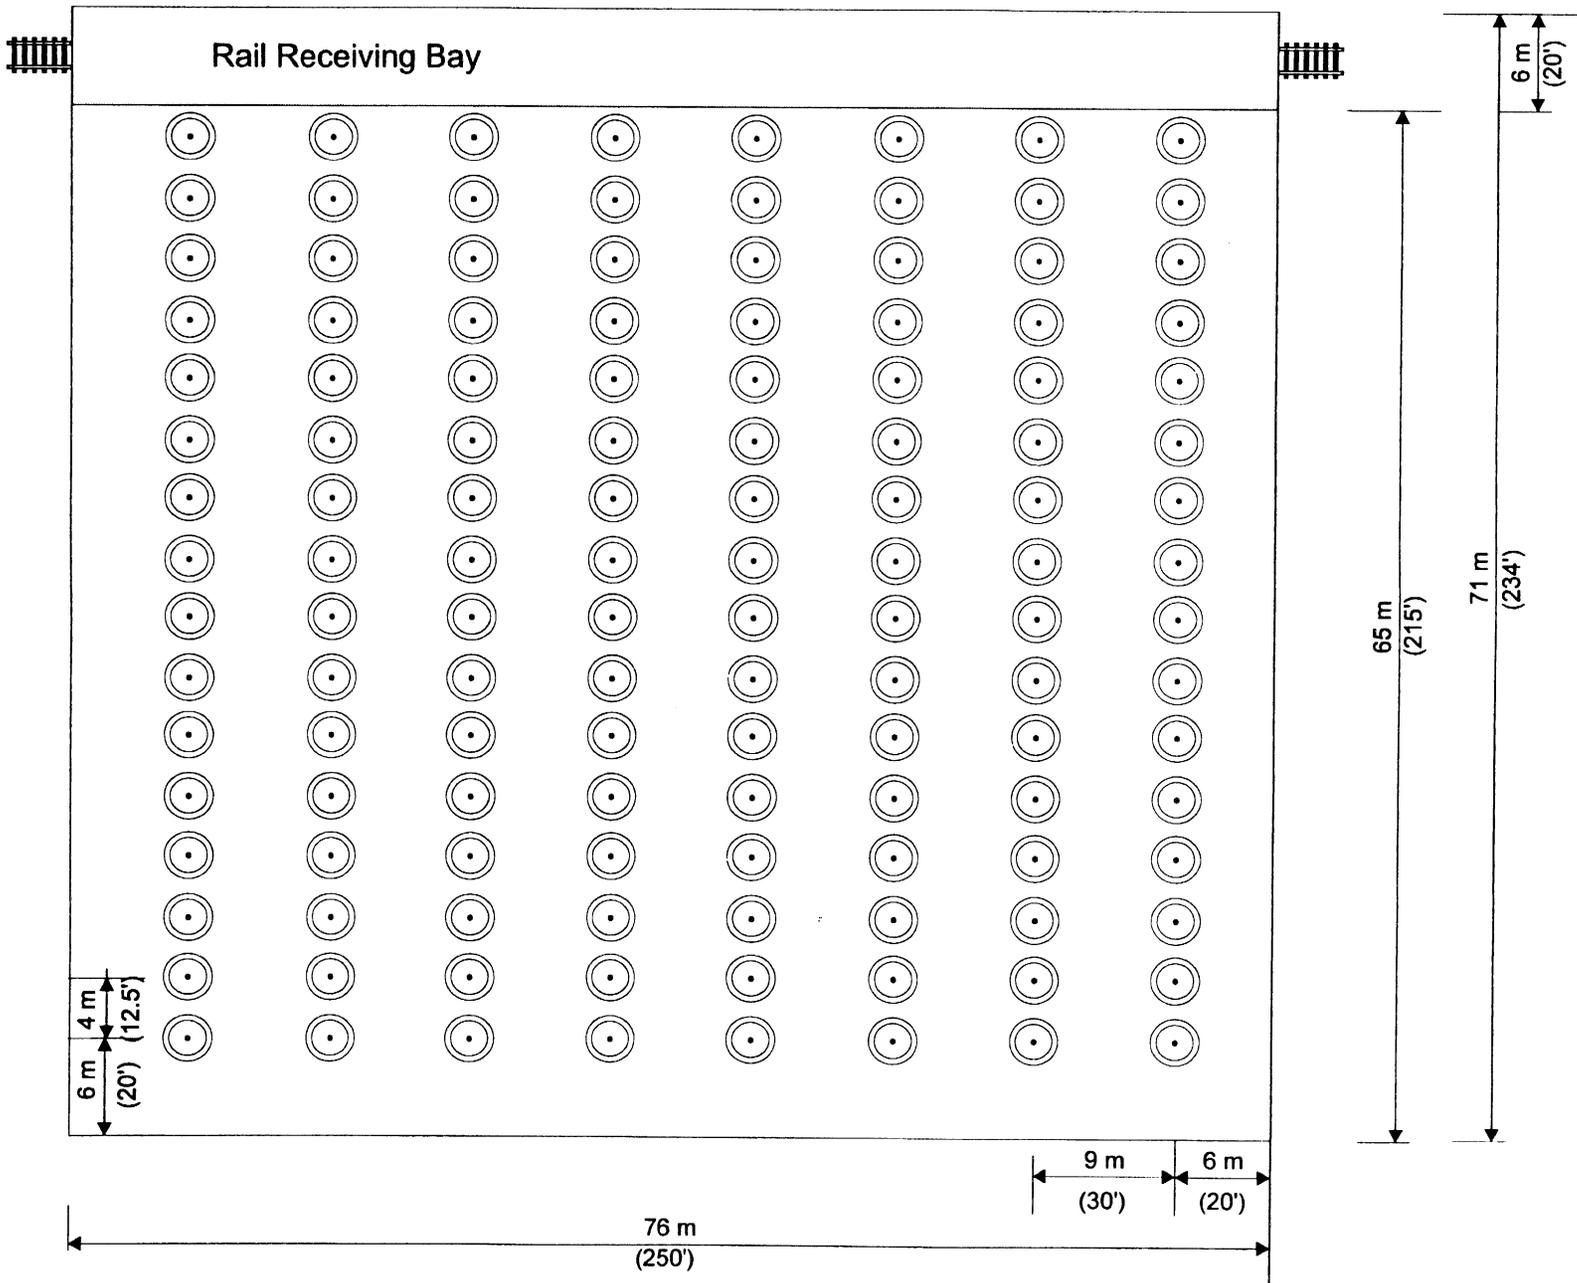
Layout of the General Warehouse and Storage Building (GWSB)
